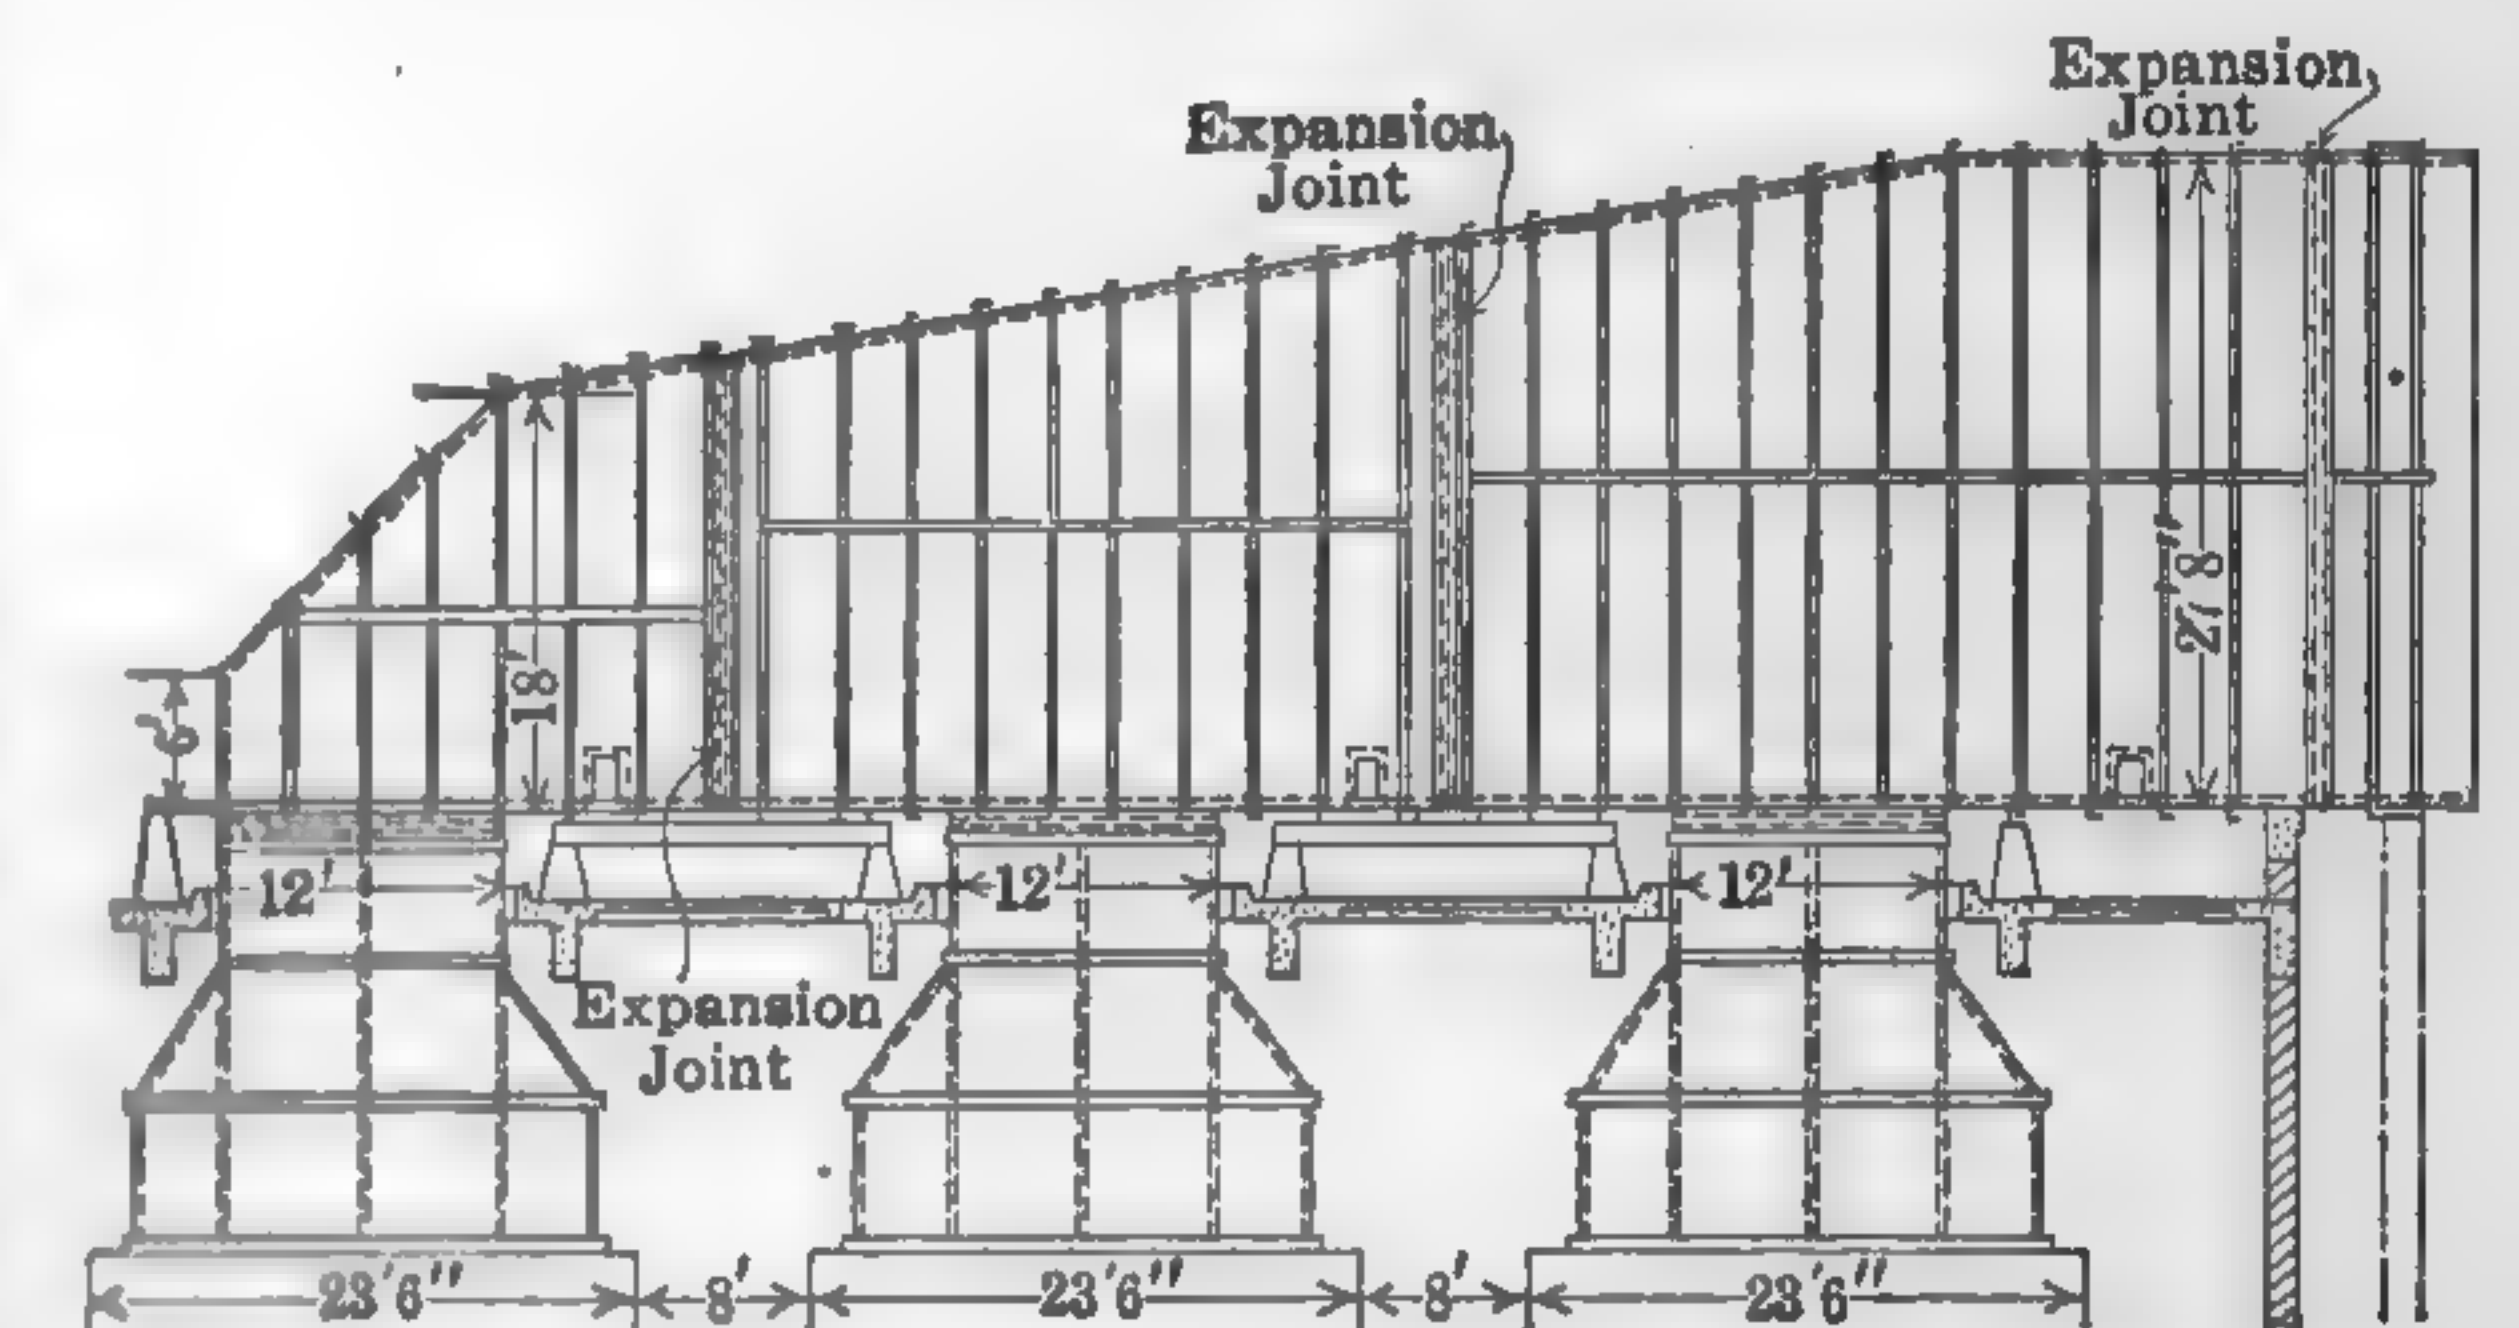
One Section of a Rectangular Breeching for Six Boilers.
